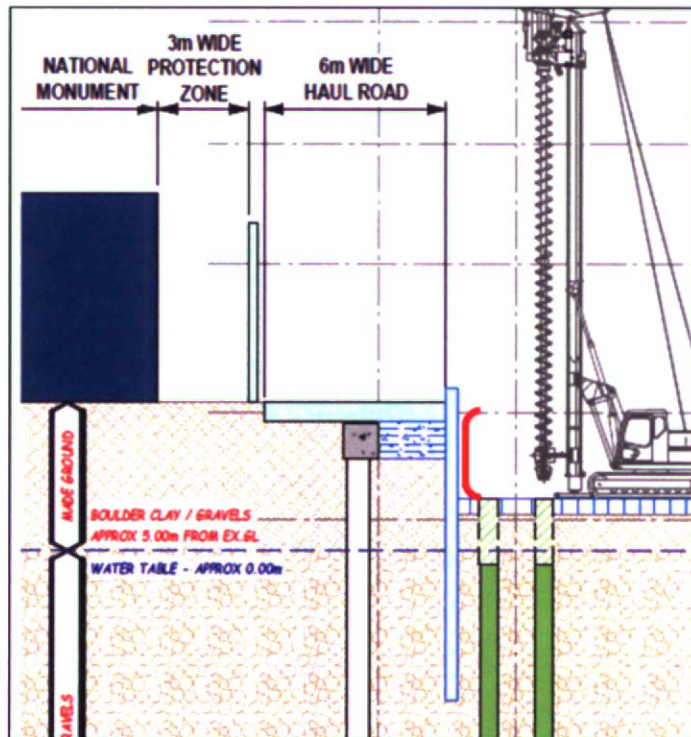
Cross section showing the National Monument (rear yard) and 3m wide protection zone and haul road
